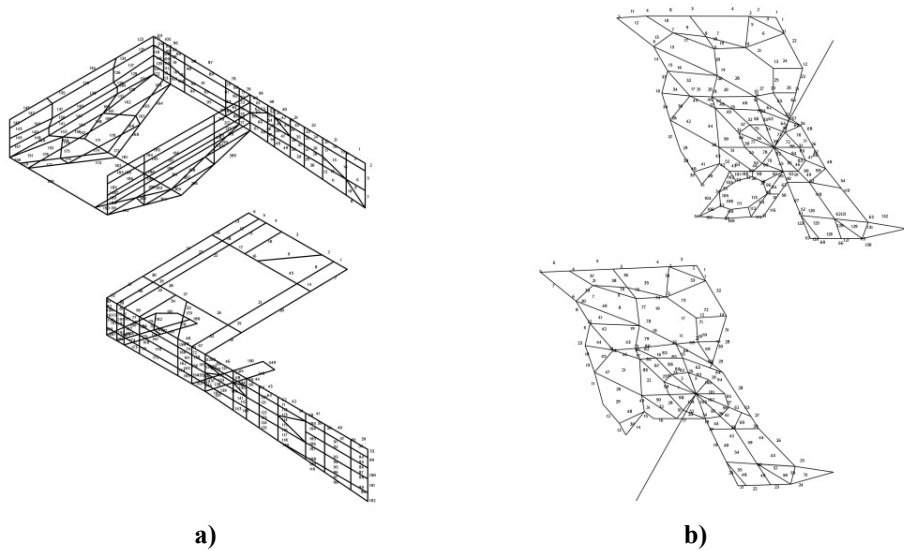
Adjusted calculation scheme of tractor semi frame (a) and gearbox of rear axle (inner walls) (b)
